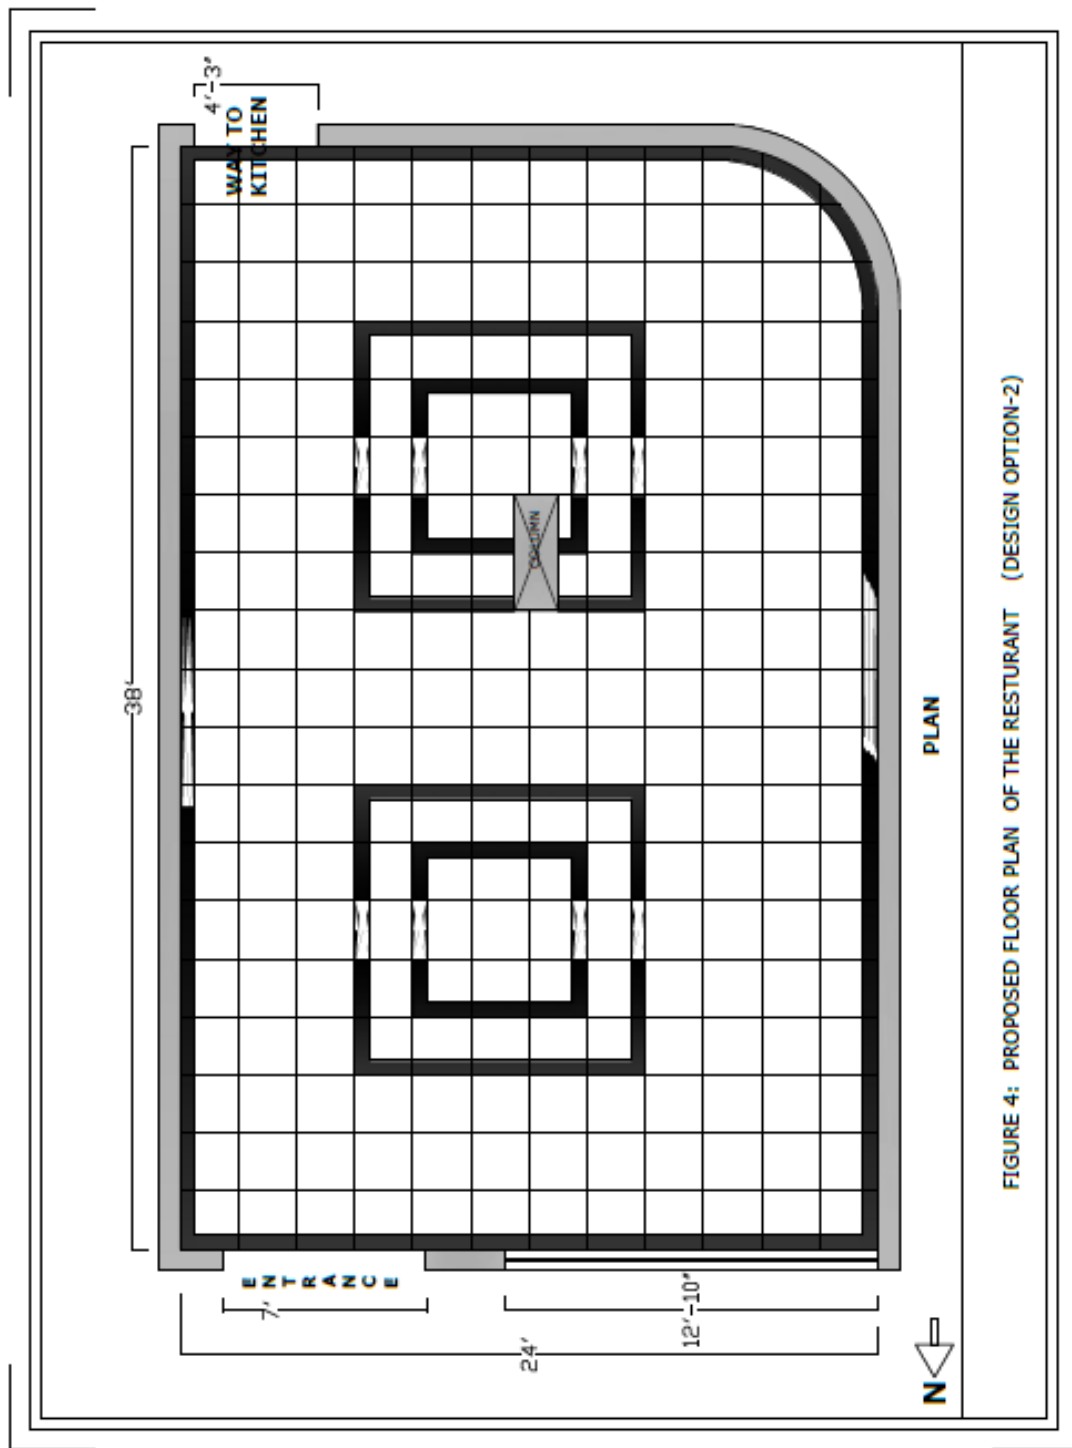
PROPOSED FLOOR PLAN OF THE RESTURANT (DESIGN OPTION-2)
